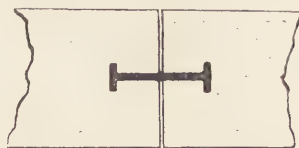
PLAN SHOWING T-FORM CRAMP.
